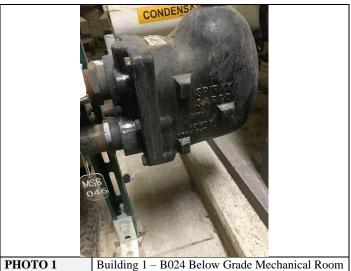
Building 1 – B024 Below Grade <0.5% lead
